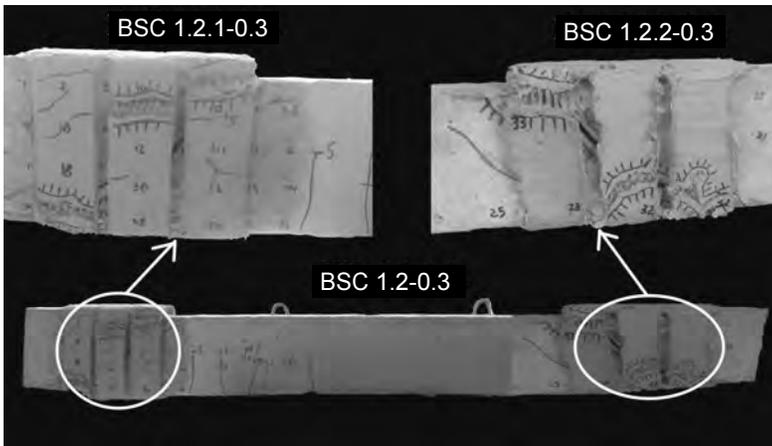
The tested strengthened beam BSC 1.2-0.3
